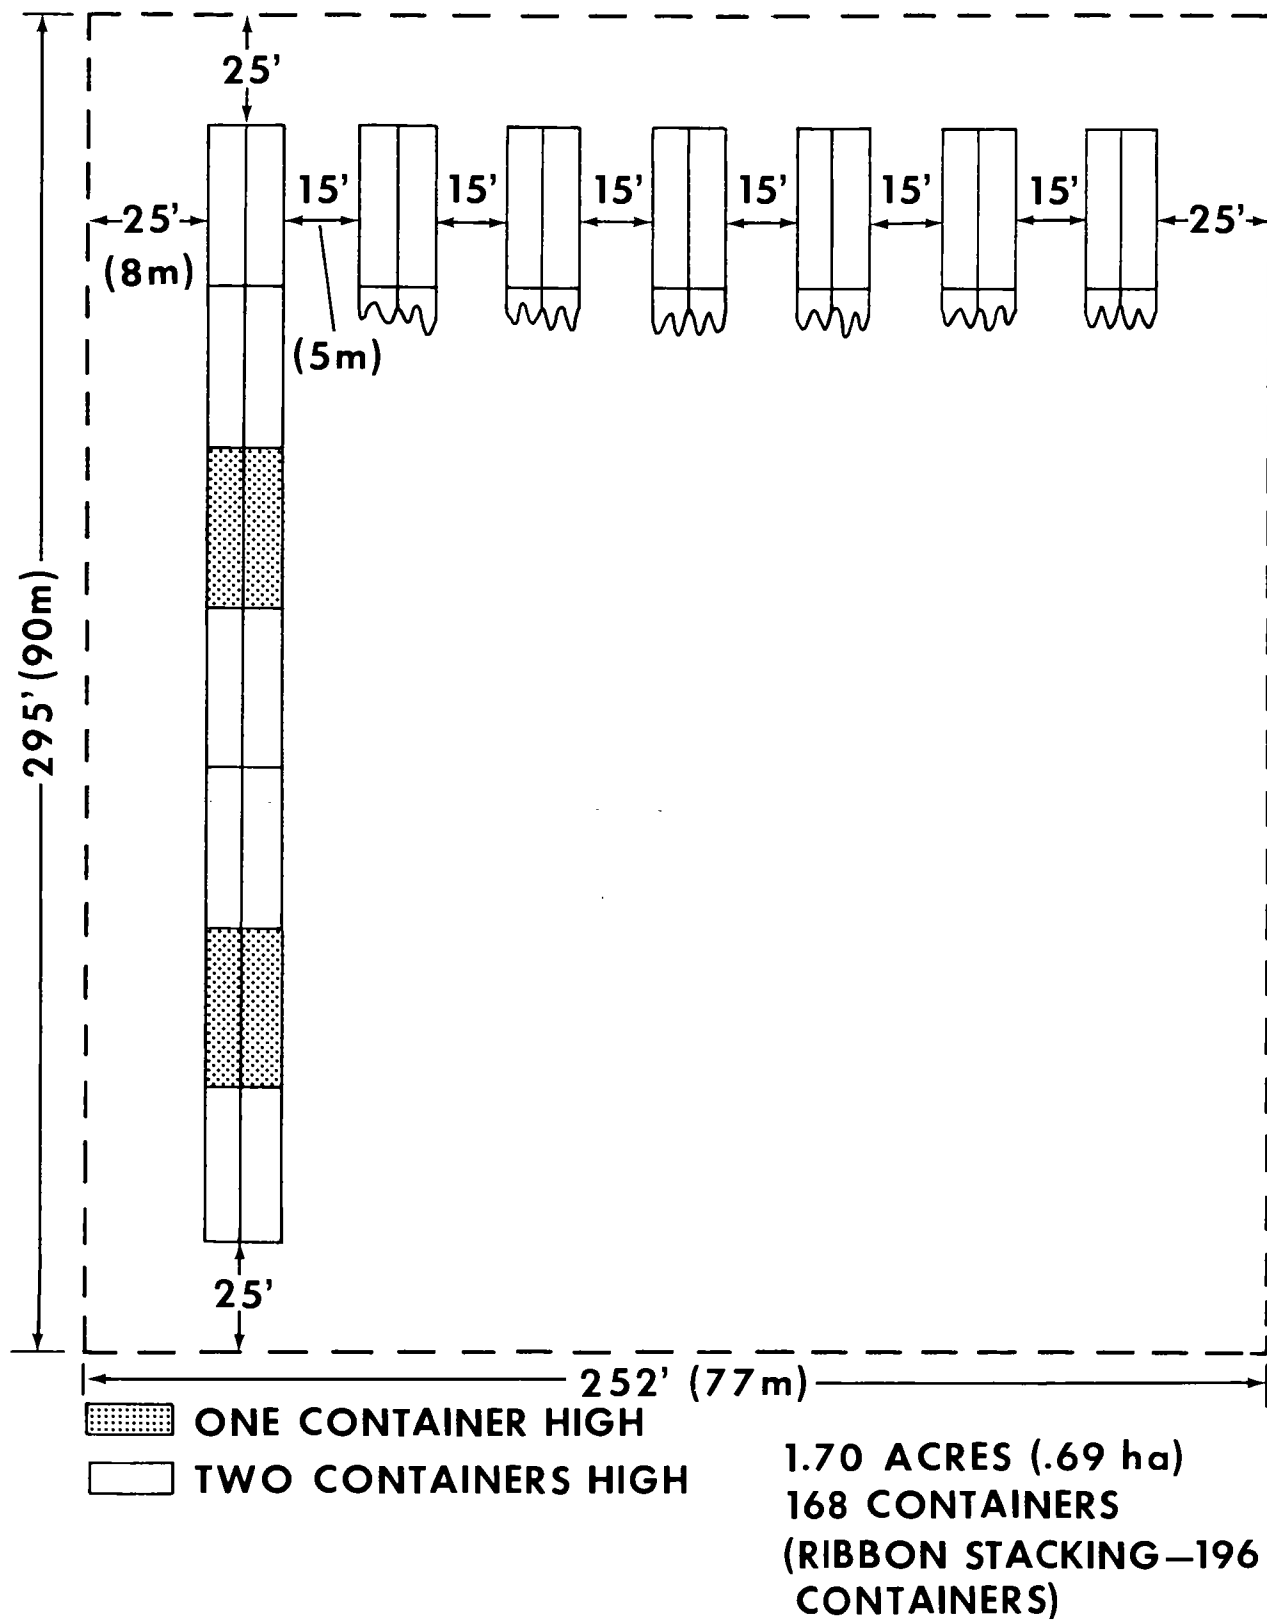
Cluster plan for sideo loader turret stacking of 35-foot containers—15-foot working aisle and 50-foot intersecting aisle.
